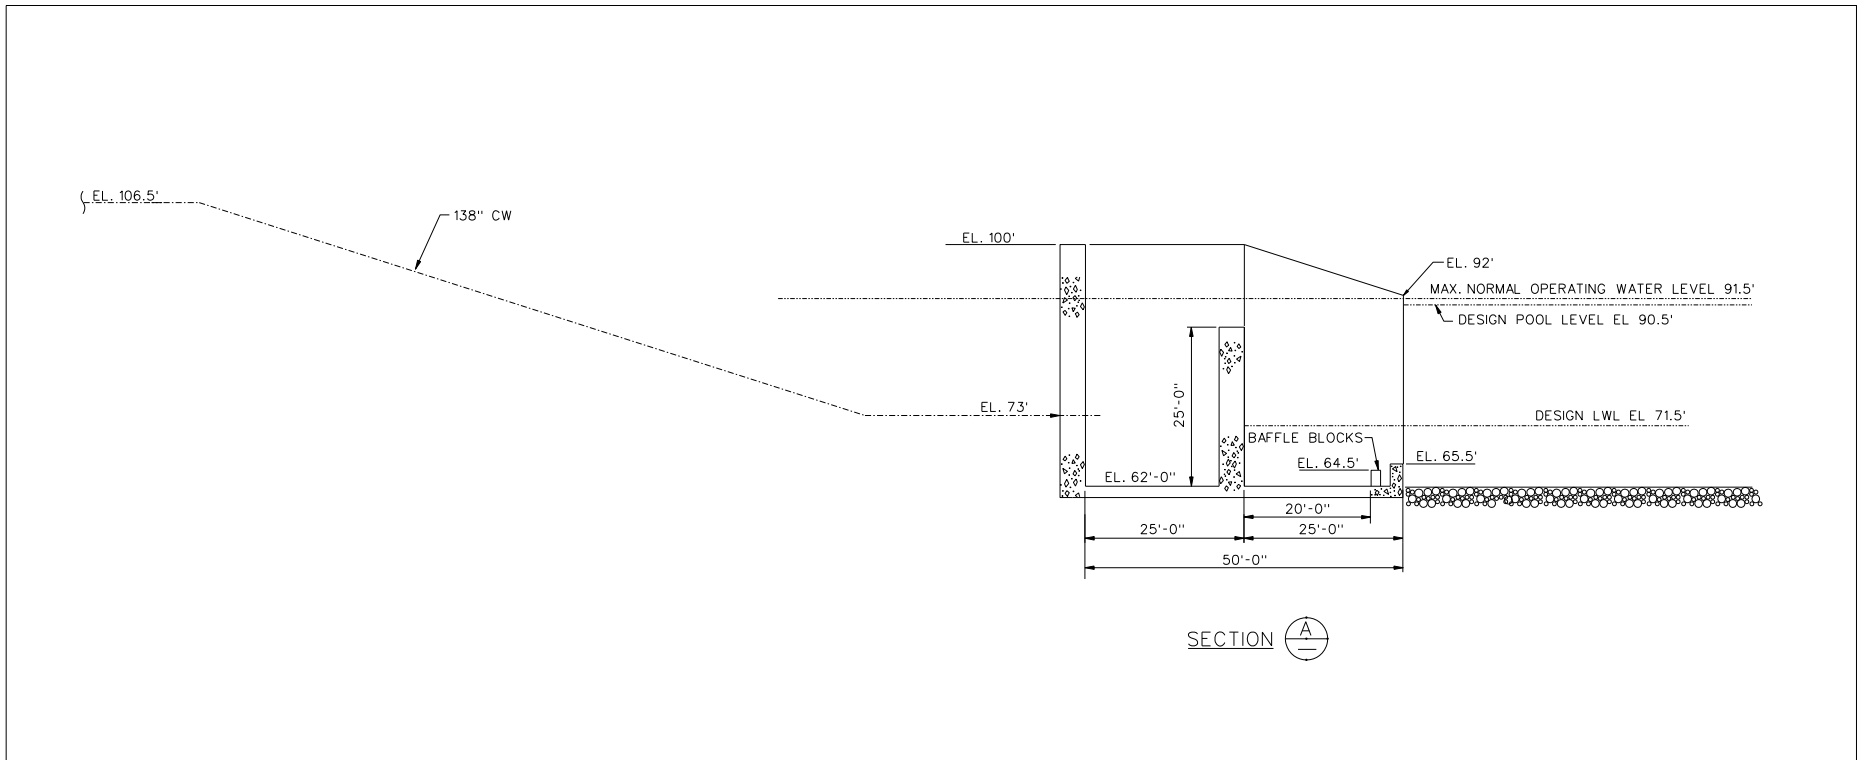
Cooling Basin Discharge Structure (Section View) — Typical
